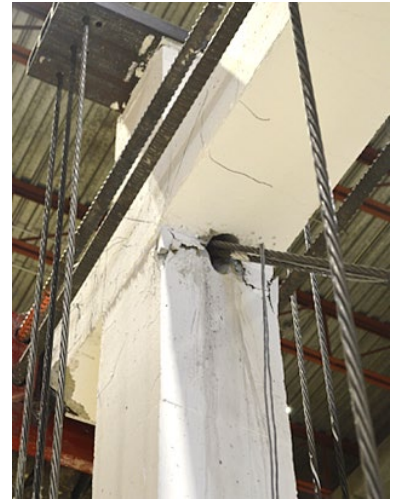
Damage observed at 2.5% drift - PEC Arrangement 2
